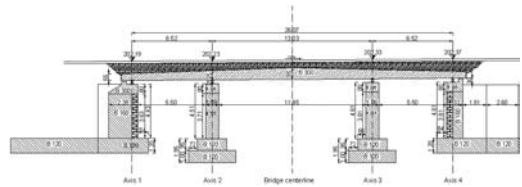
Ringstraßenbridge longitudinal section of bridge axis.
